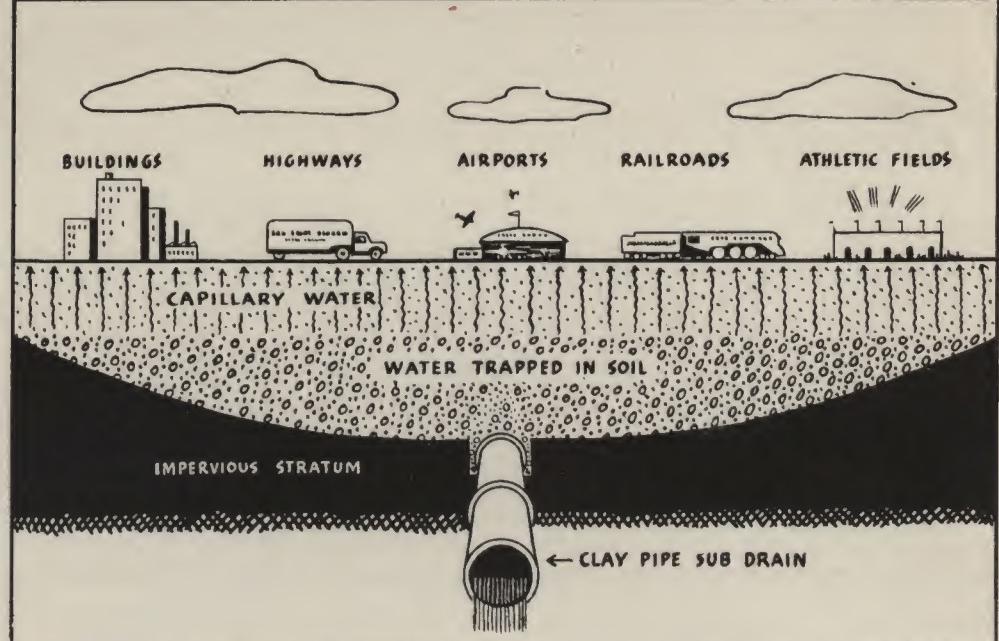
This sketch shows in general the principle of subsoil drainage. A dense, impervious layer in the soil traps percolating water, forming a layer of water-soaked earth which lacks the stability to support buildings, highways, railways, airport runways, and other heavy or load-bearing structures. A clay pipe subdrain laid below the trapped water drains it off and stabilizes the earth.
